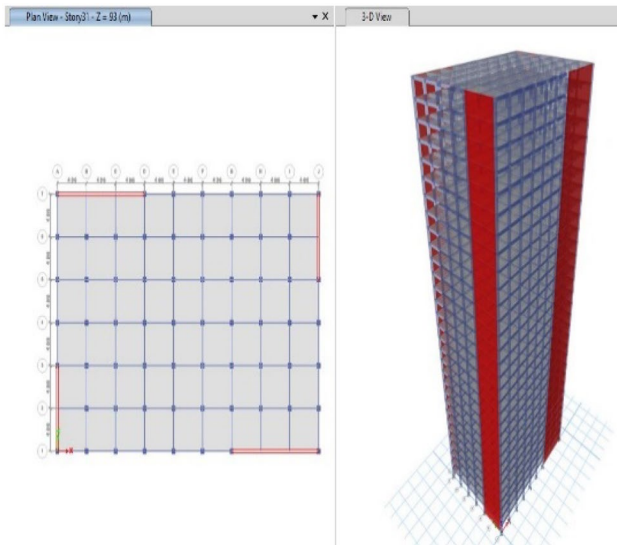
Model-3: Buildings with shear wall located at all four corners-2
